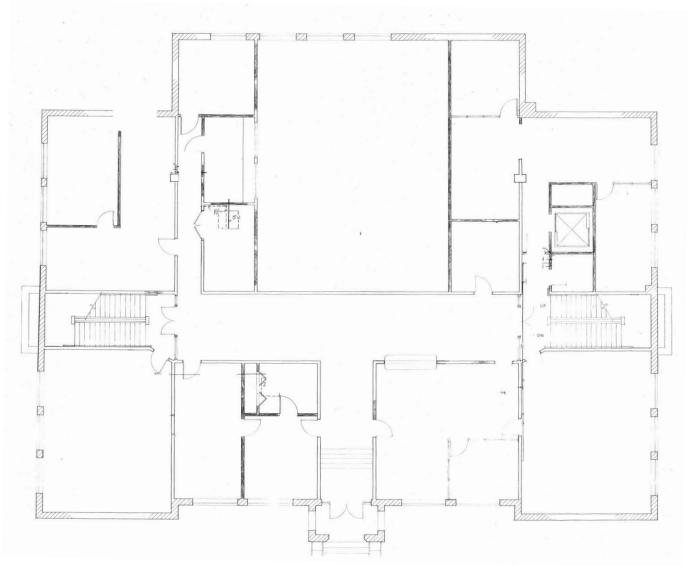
second floor plan, existing (Killis Almond & Assoc. 1993)
